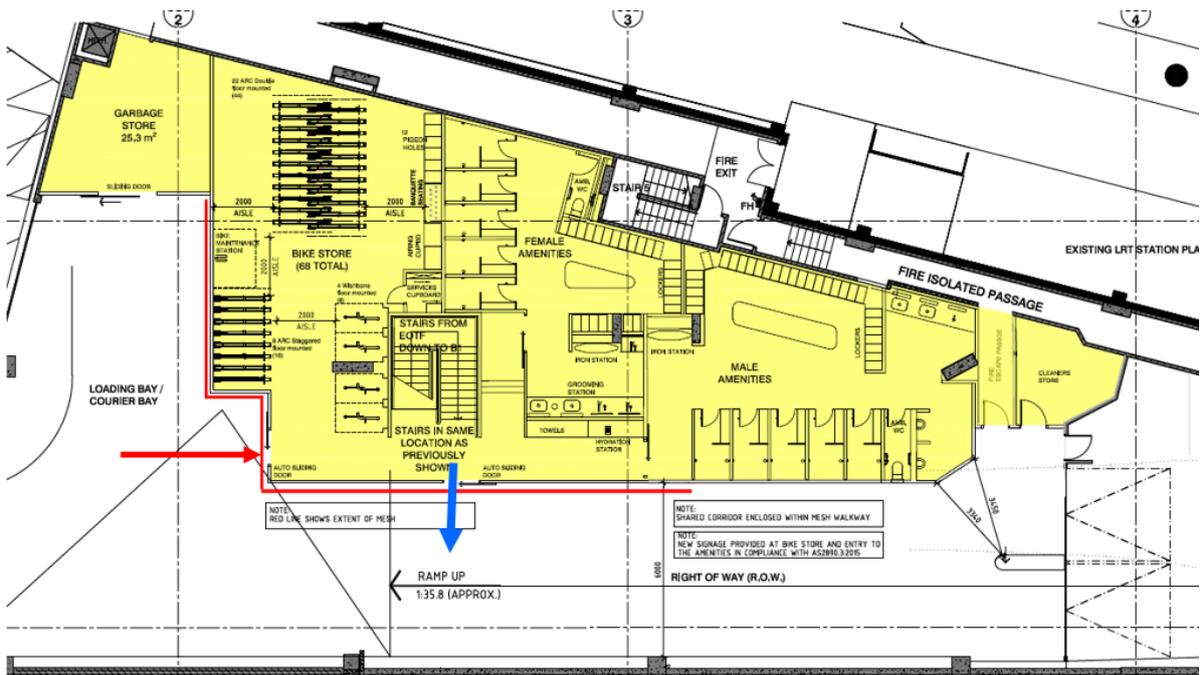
Amended drawings showing that users of the end of journey facilities access the facilities and the staircase to enter the building via a single automatic door that is not located within the shared driveway area (red arrow). An emergency egress door is located at the southern end of the facilities (blue arrow).
